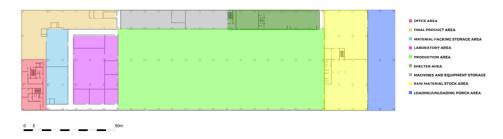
General Arrangement of Different Spaces on the Nitrile manufacturing factory's Ground Floor. (Adopted and modified by author)
